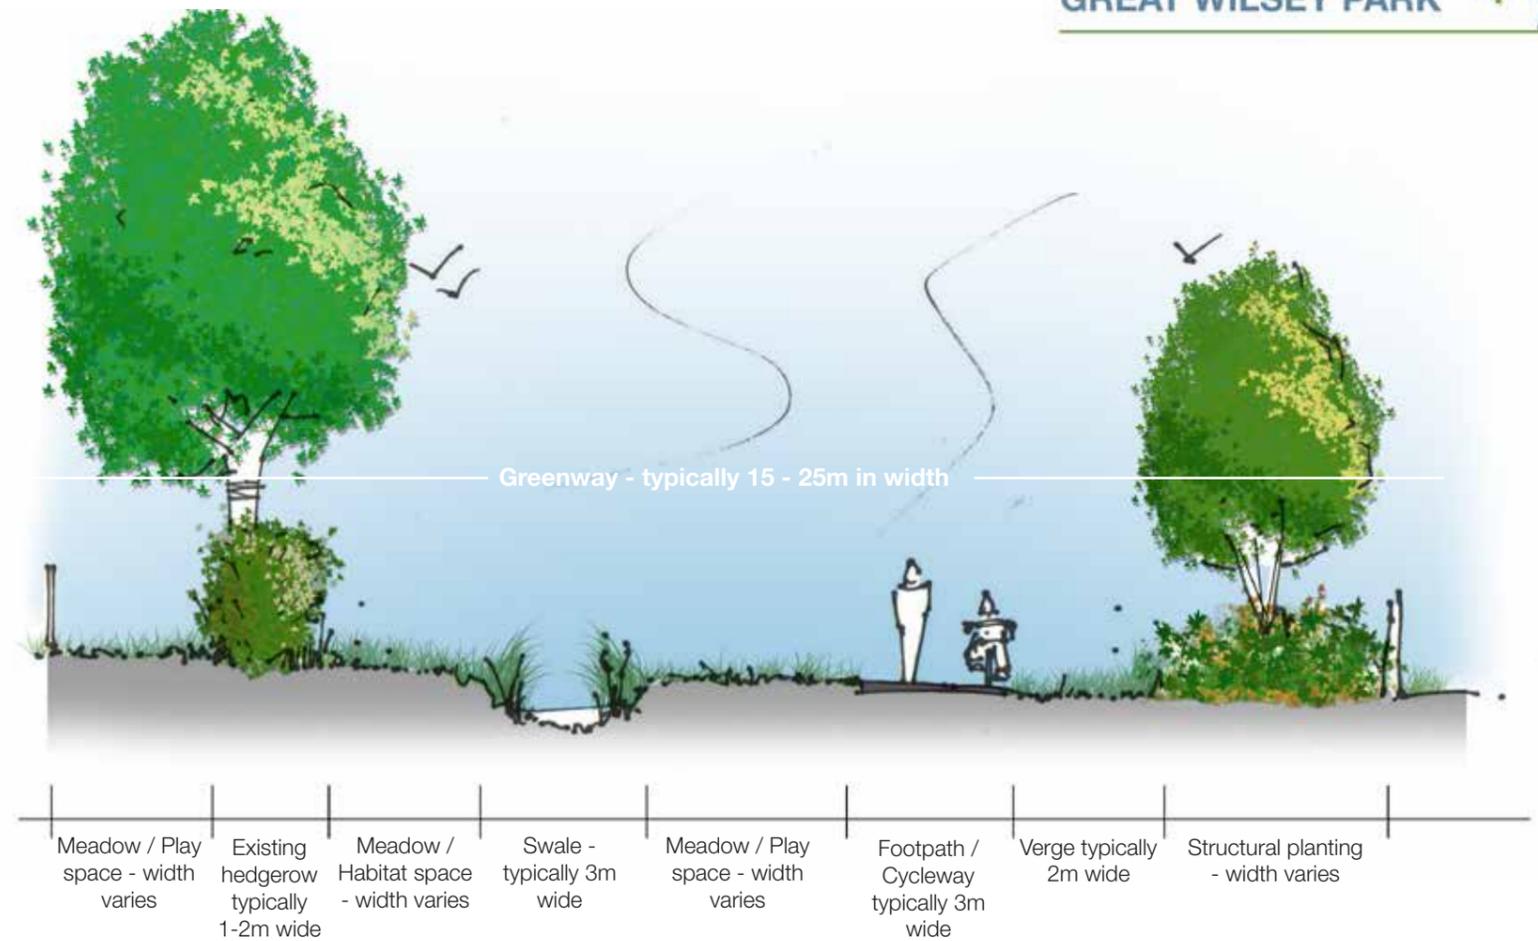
TYPICAL SECTION THROUGH A GREENWAY. N.T.S
